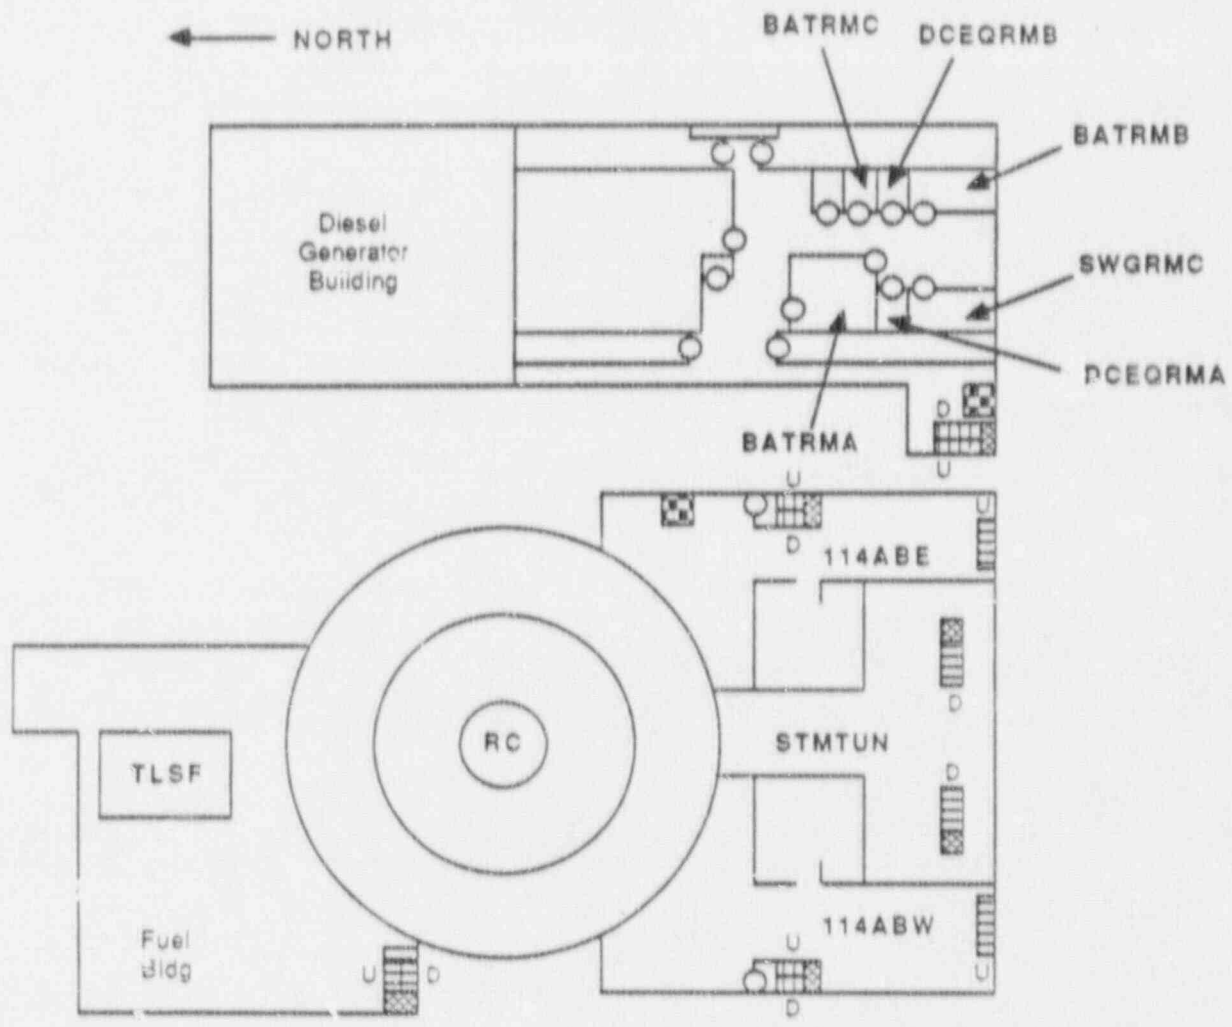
River Bend 1 Station Arrangement, Elevation 114'
